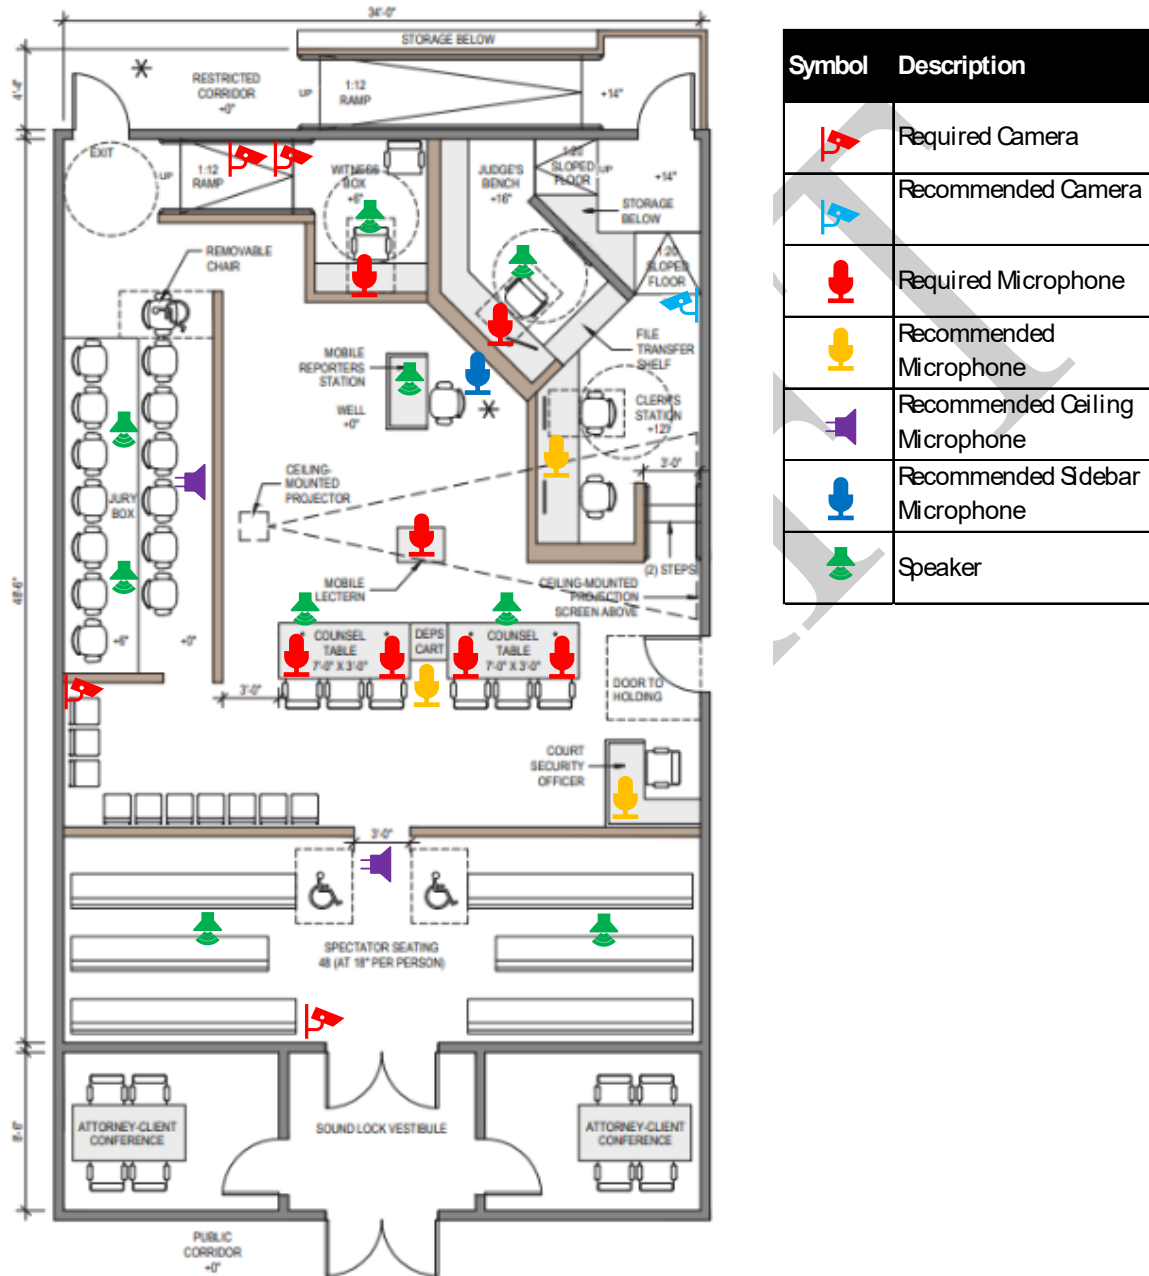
Typical Trial Courtroom—Corner Bench A
